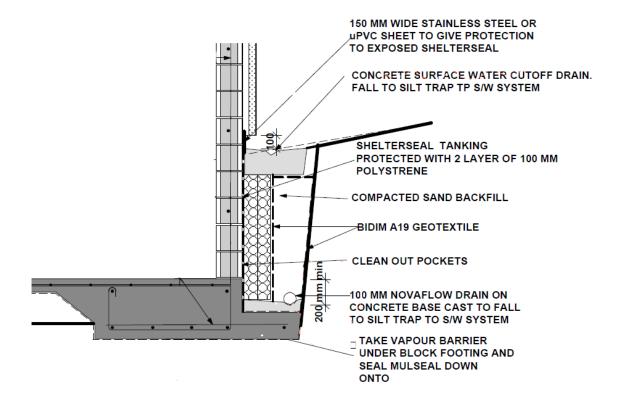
Excerpt from approved plans showing construction detail for the tanking system.
